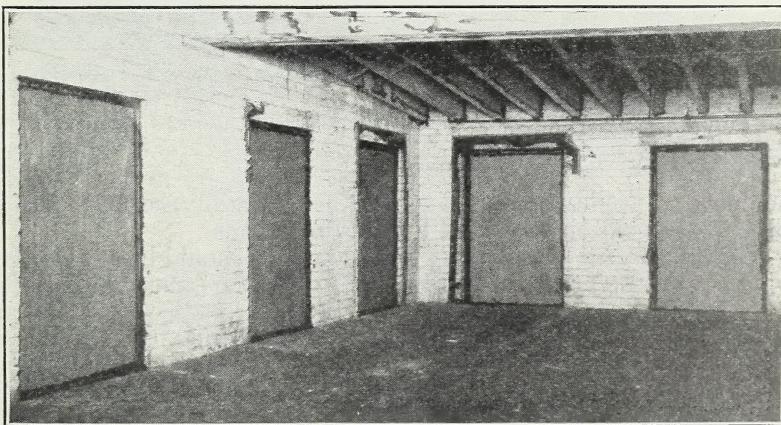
Windows sealed on the inside with paper. Cracks about unions of rafters and walls are sealed with plastic elastic. (Photograph furnished by W. D. Reed.)
